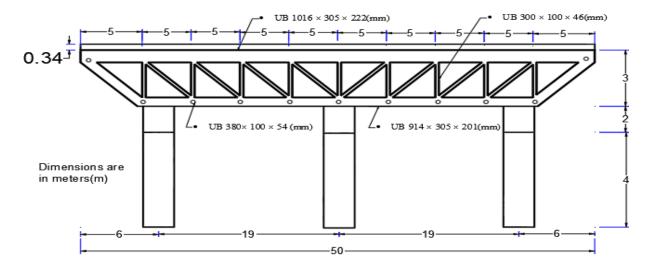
Proposed 2D model for the Over-Truss Bridge. (AutoCAD)
